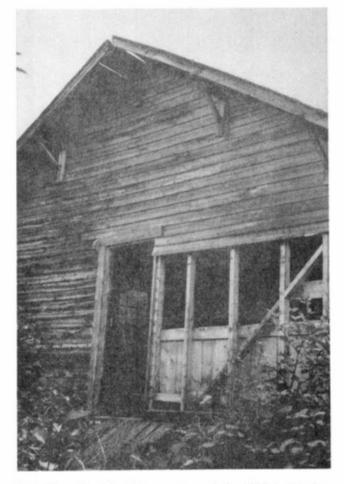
West building, north end, in 1977 just before it was destroyed. Note where siding had been taken off. (BLM photo.)
